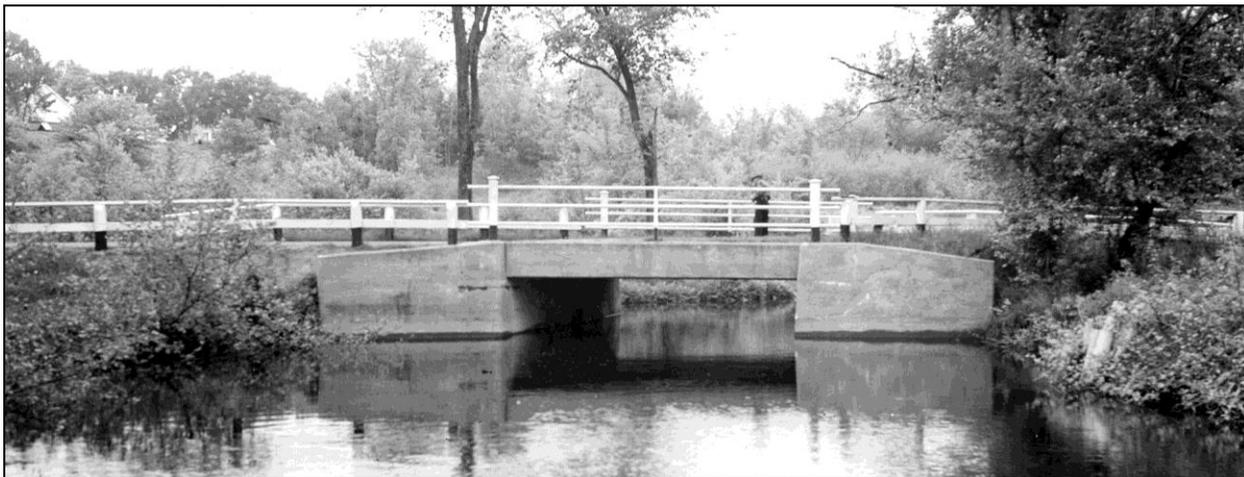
Bow 135/160 Turkey River Bridge (1911). Downstream side shown 30 years later when inspected and recorded by New Hampshire Highway Department (NHHD) on May 22, 1942. Note new post and plank approach guardrails and original pipe guardrails painted white (NHHD Bridge Inventory Card).
